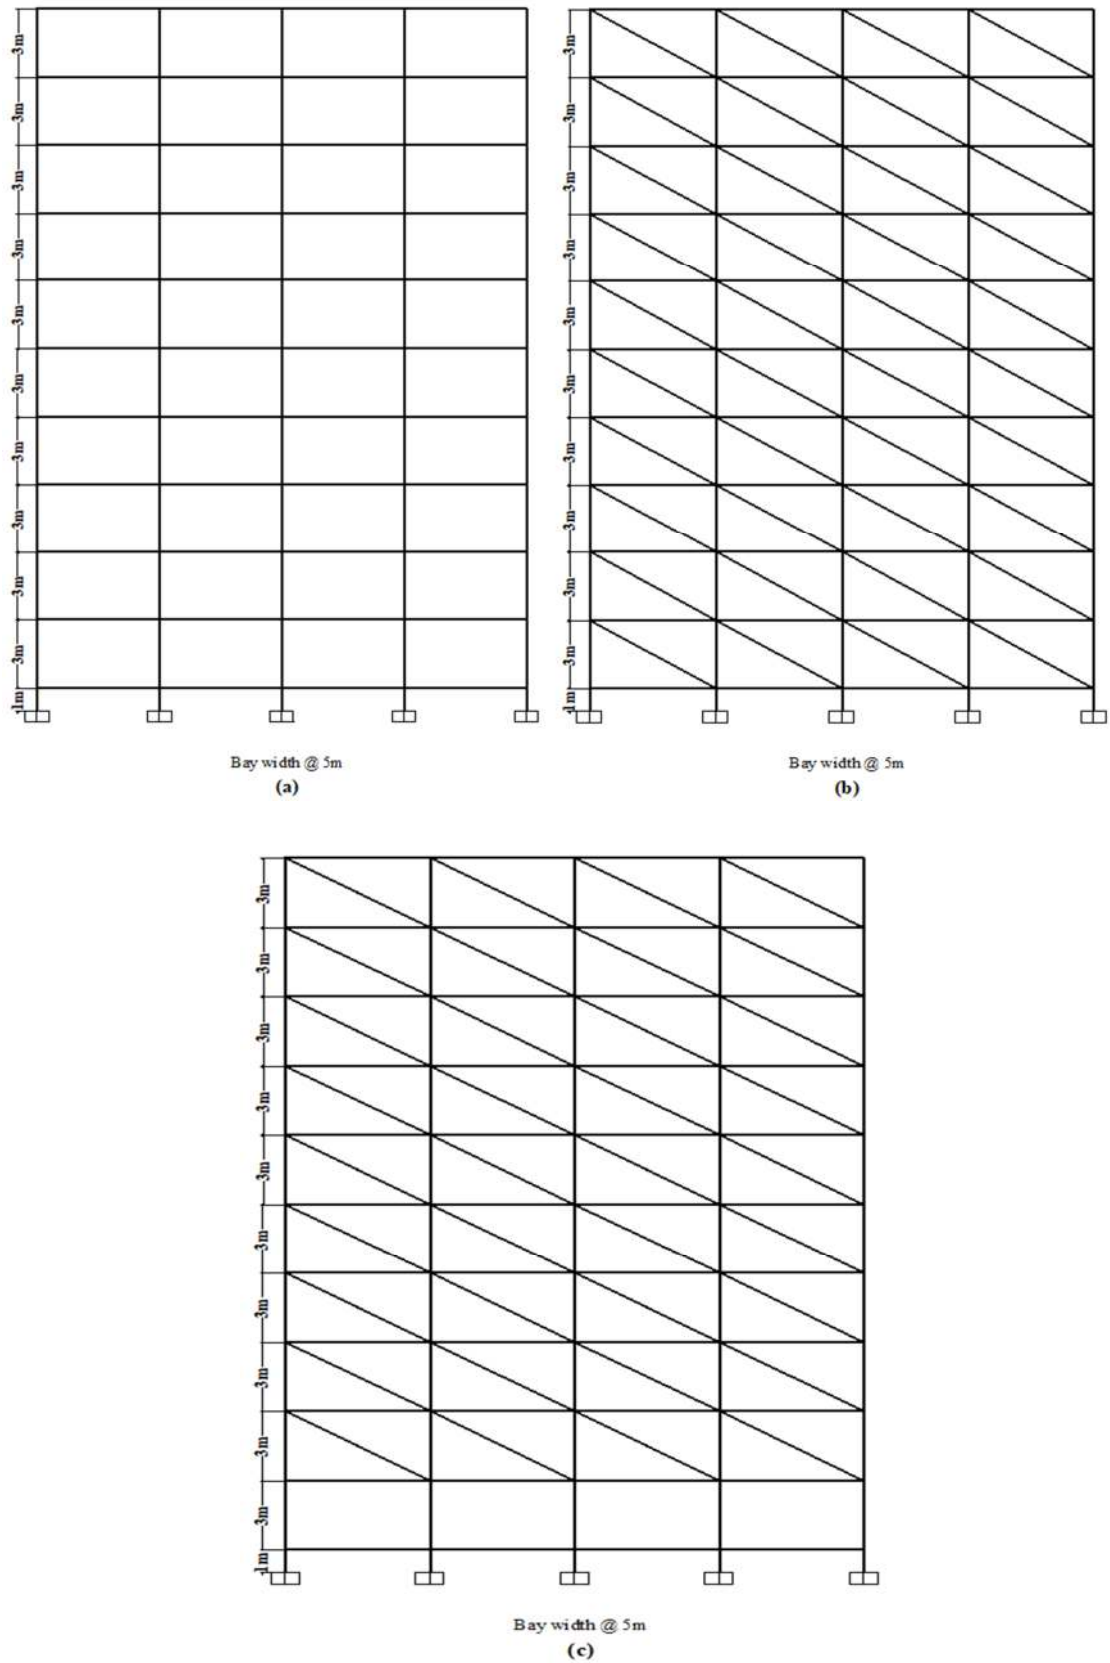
Elevation of 10-storied (a) Bare frame, (b) Fully infilled frame and (c) OGF frame
